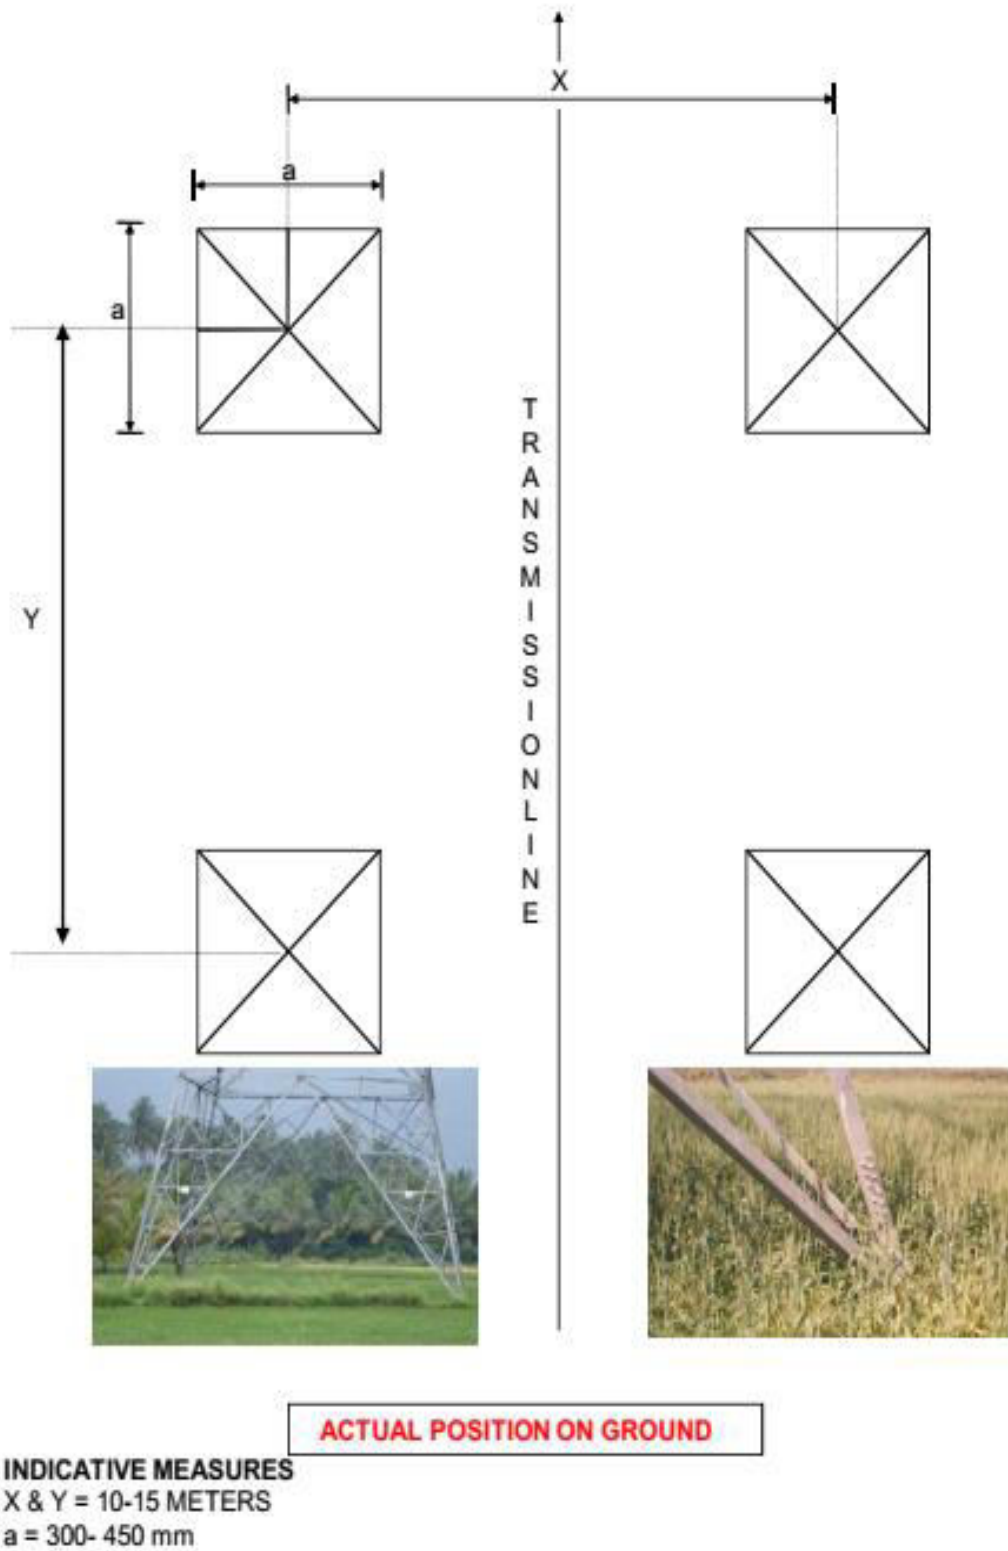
Typical Plan of Transmission Line Tower Footings Showing Actual Ground Position and Extent of Impact
